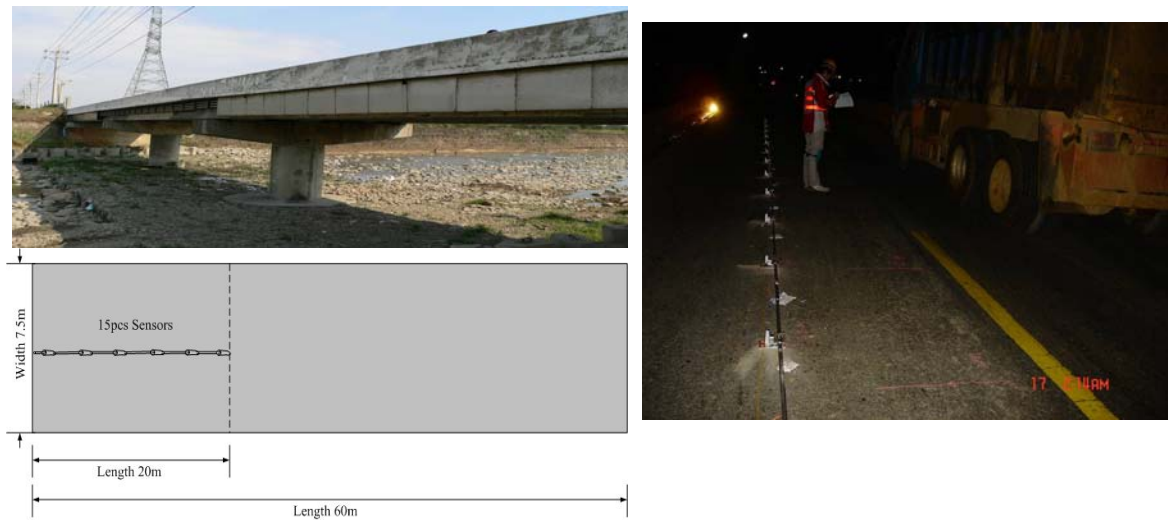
Left top, slanted view of bridge MD01. Left bottom, layout of 15 FBG bending gauges on the bridge. Right, ultra-heavy loading tests being conducted.
